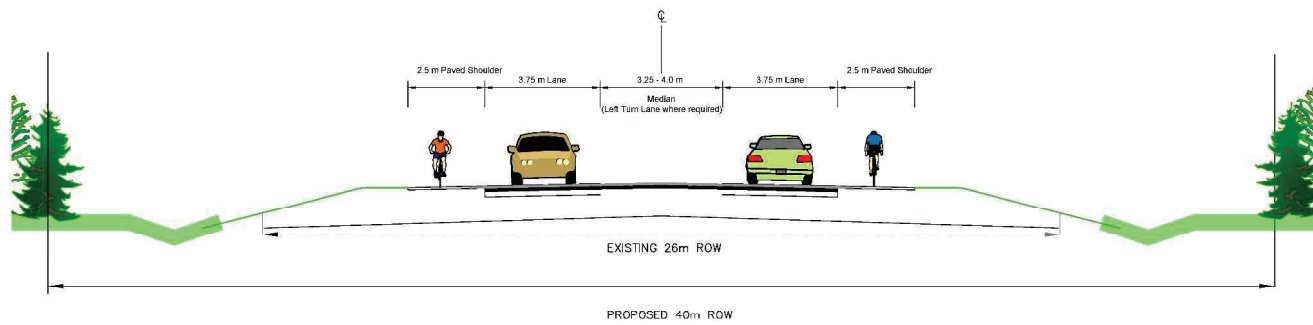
Section 3 Alternative 2 - 3-Lane Rural Cross Section
